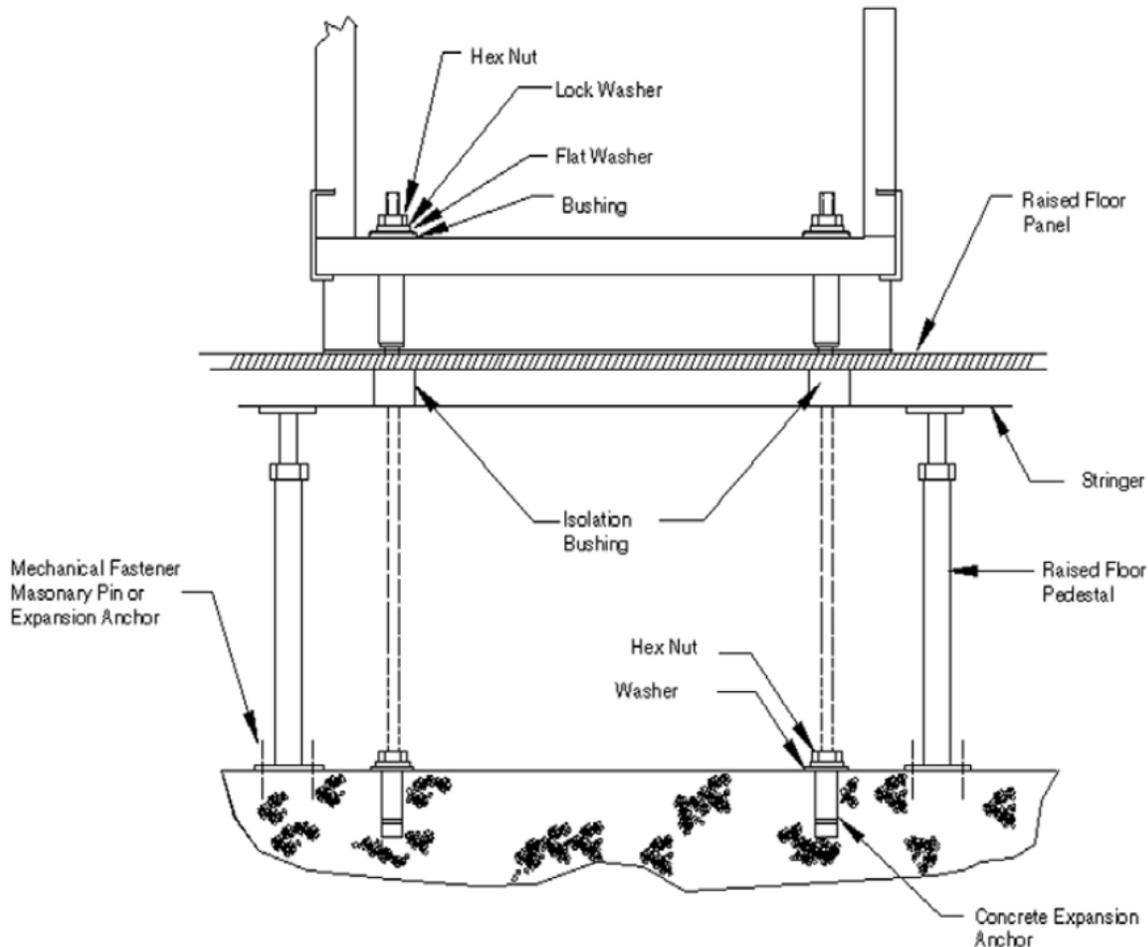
Equipment Mounting in Light Seismic Zone
